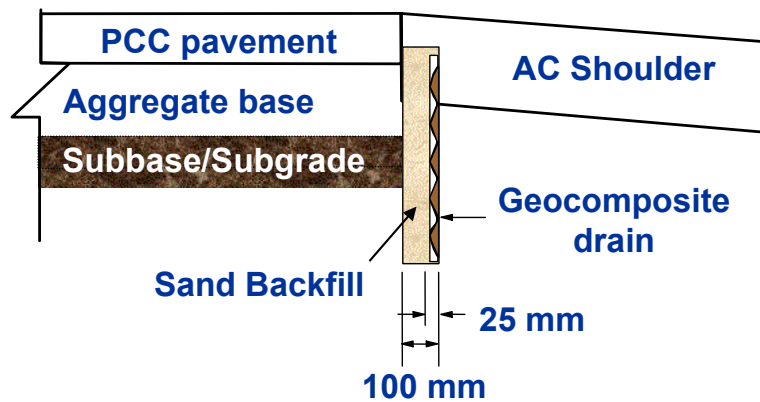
Typical PCC pavement with geocomposite edgedrains (ERES, 1999).
